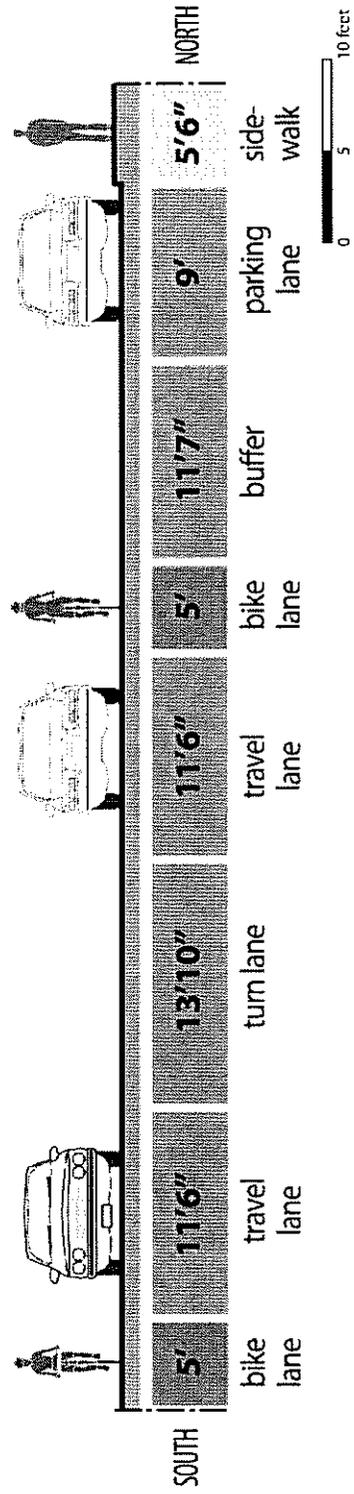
Section of Proposed Improvements for Project 1: SFD at Olema Road (west)
